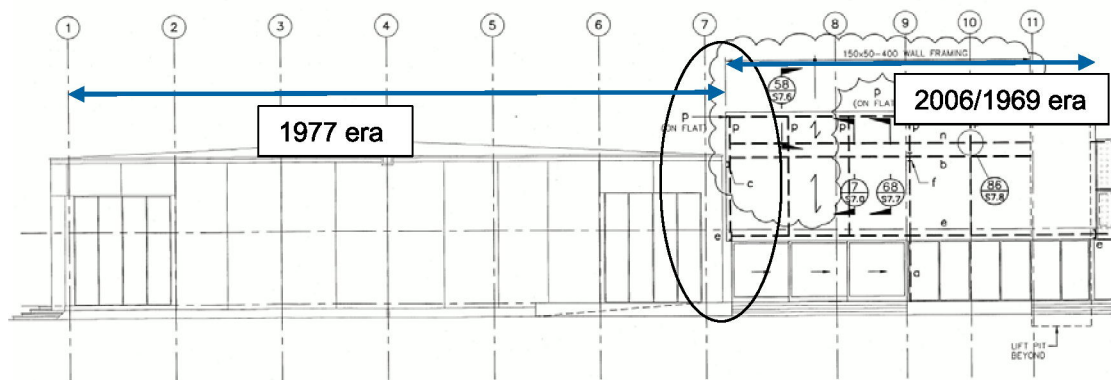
Example of structural separation between 1977 gallery building and the rest of the Dowse
